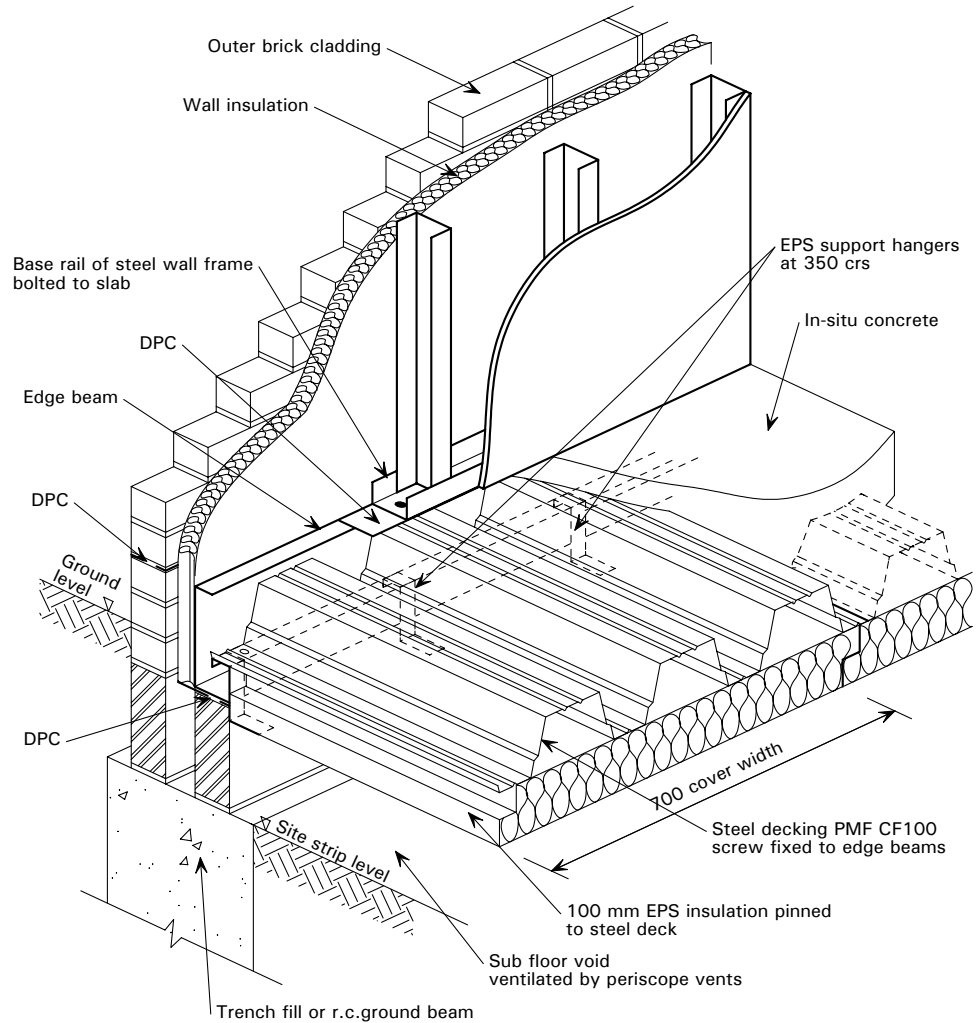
Isometric detail of a flat panel insulation layout
